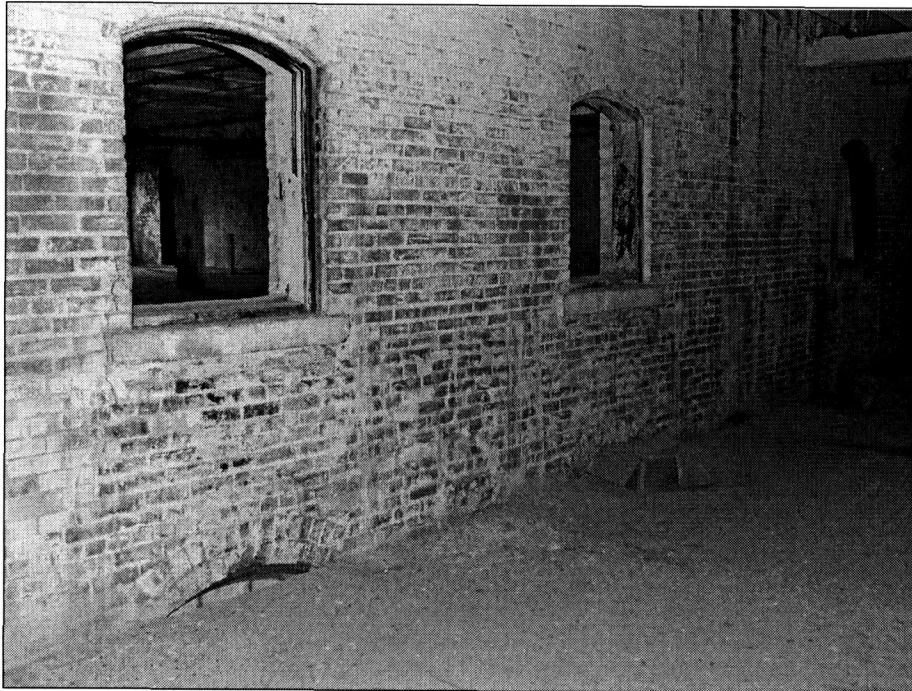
The second floor level of the courtyard infill cuts across windows in the south, evidence of the re-use of the 1883 walls in conjunction with different 1891 floor levels, wall of the press house, view northeast (photo by J. Jacobsen, May 2007)
